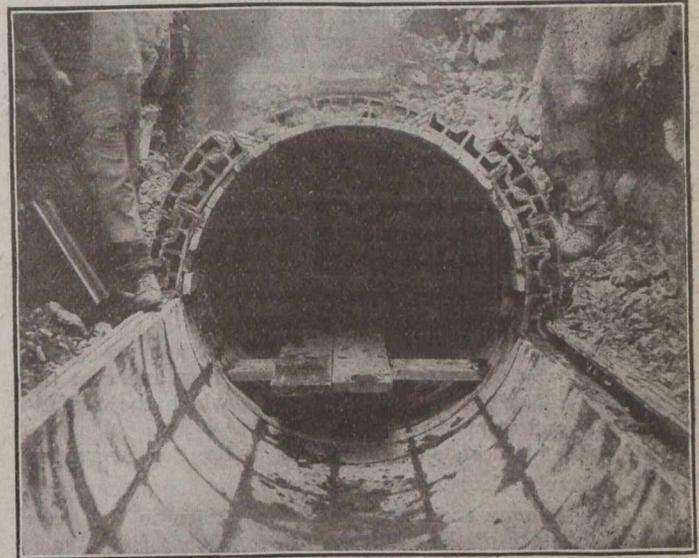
BLOCK SEWER ON STRATHCONA PARK DRIVE
